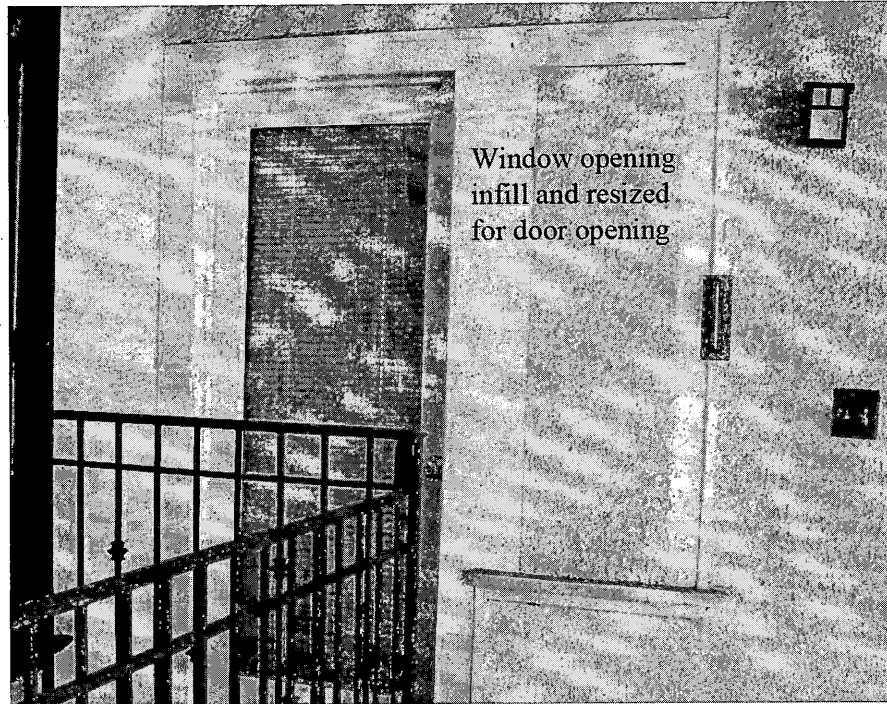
Looking north, south elevation of rear upper story, window opening infill and resized for door opening; 1994 alteration permit.
